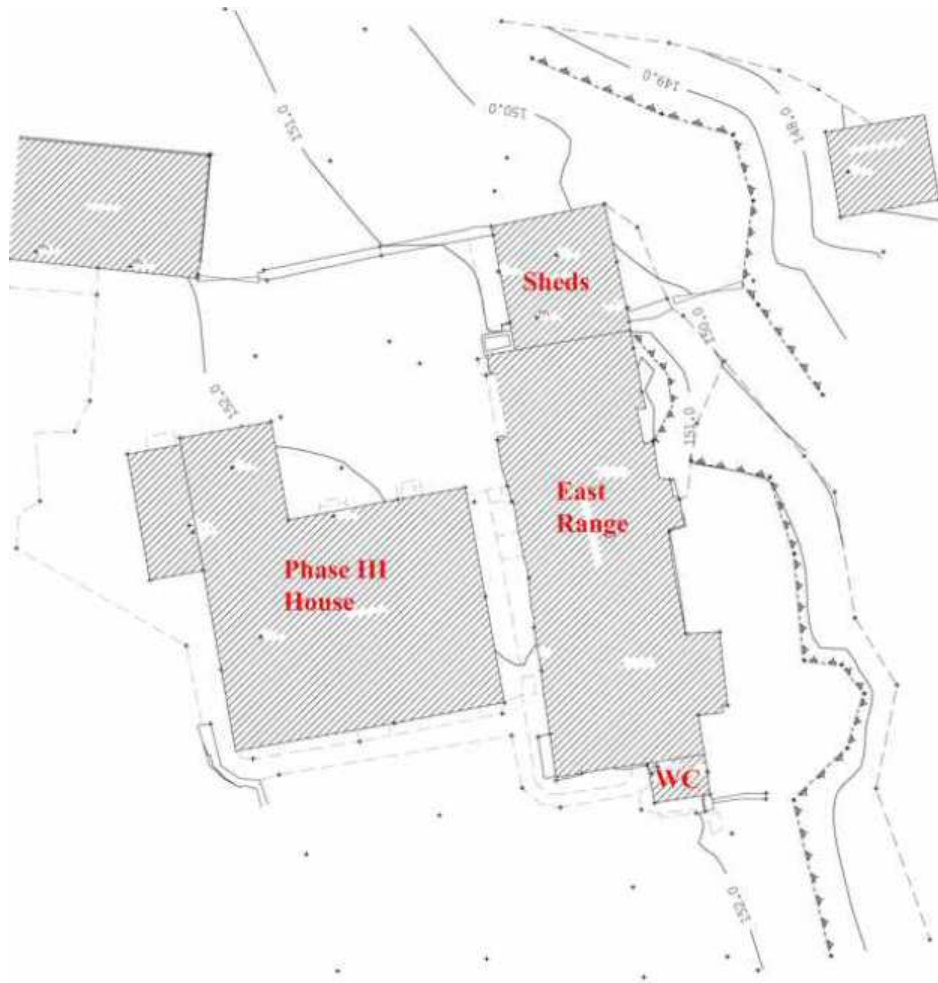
Plan of the Landmoth Hall site to show the layout and arrangement of the buildings (after Colin Briden)
